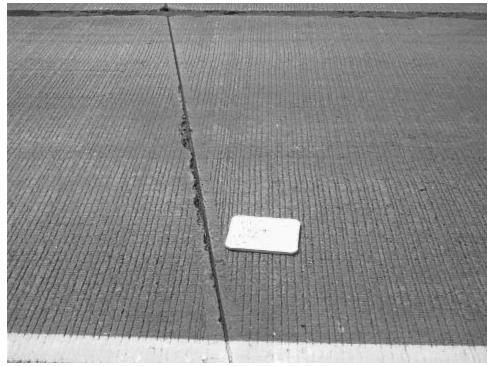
Typical high-severity spalling on 1-WI2.
